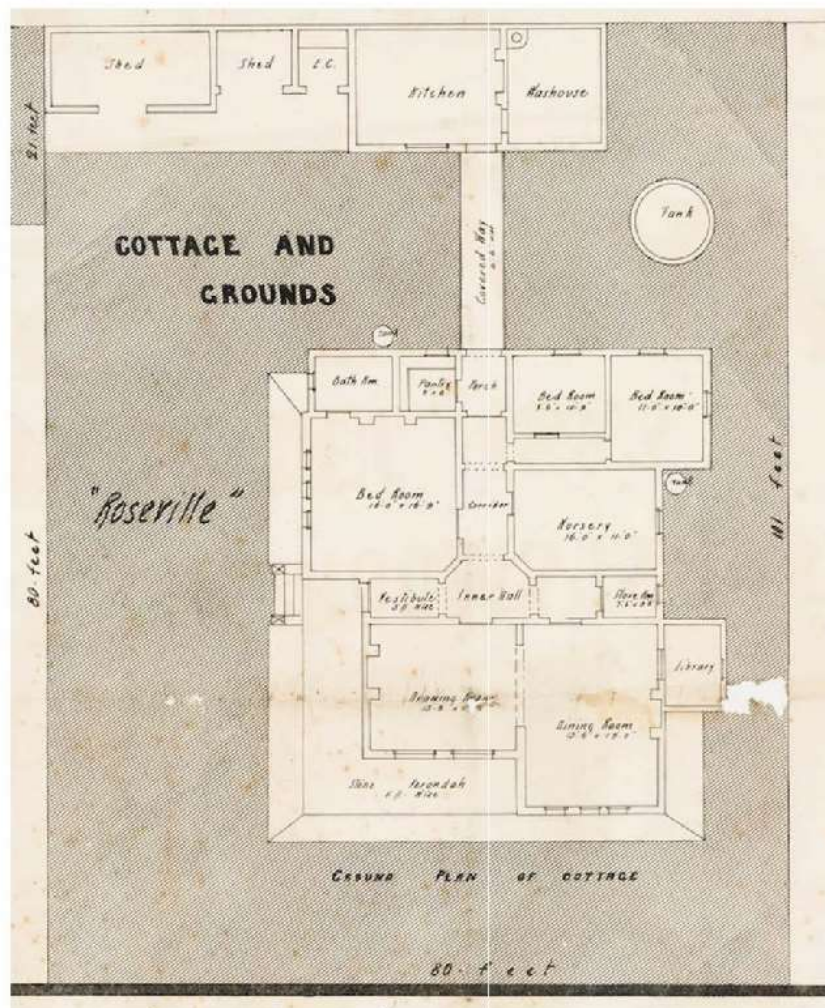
Plan of "Roseville" from the December 1887 auction notice. The plan indicates the location of the above-ground and underground water supply tanks as well as the configuration of the outbuilding with the Earth Closet. The underground tank may remain in-situ under the ground. The only part of the outbuilding still remaining is the section containing the spaces for the Kitchen and Wash House.
